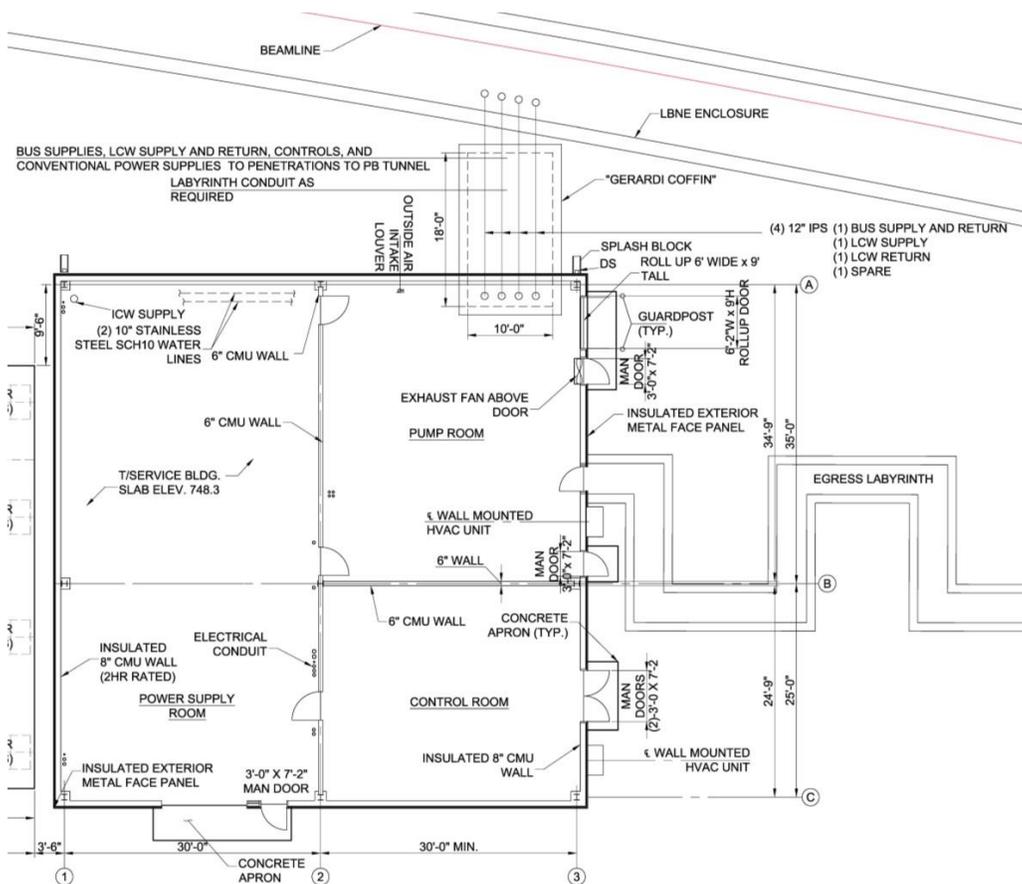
Primary Beam Service Building (LBNE 5) Floor Plan.
